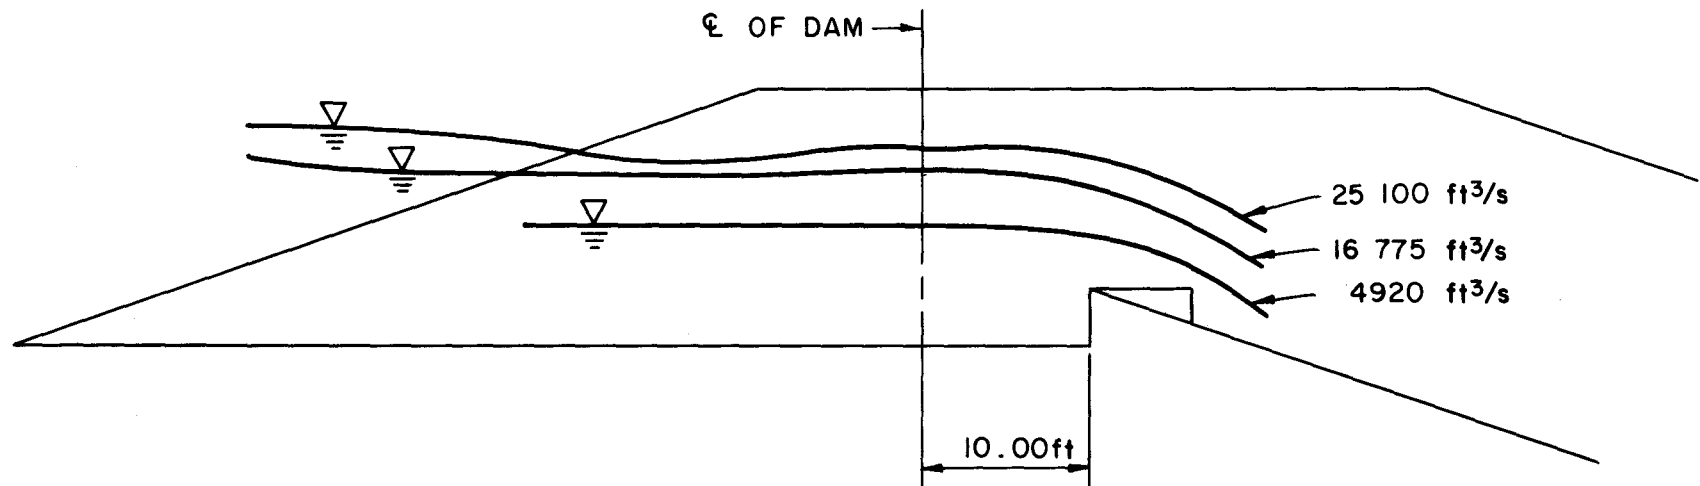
Water surface profiles 15 ft from the left sidewall.
